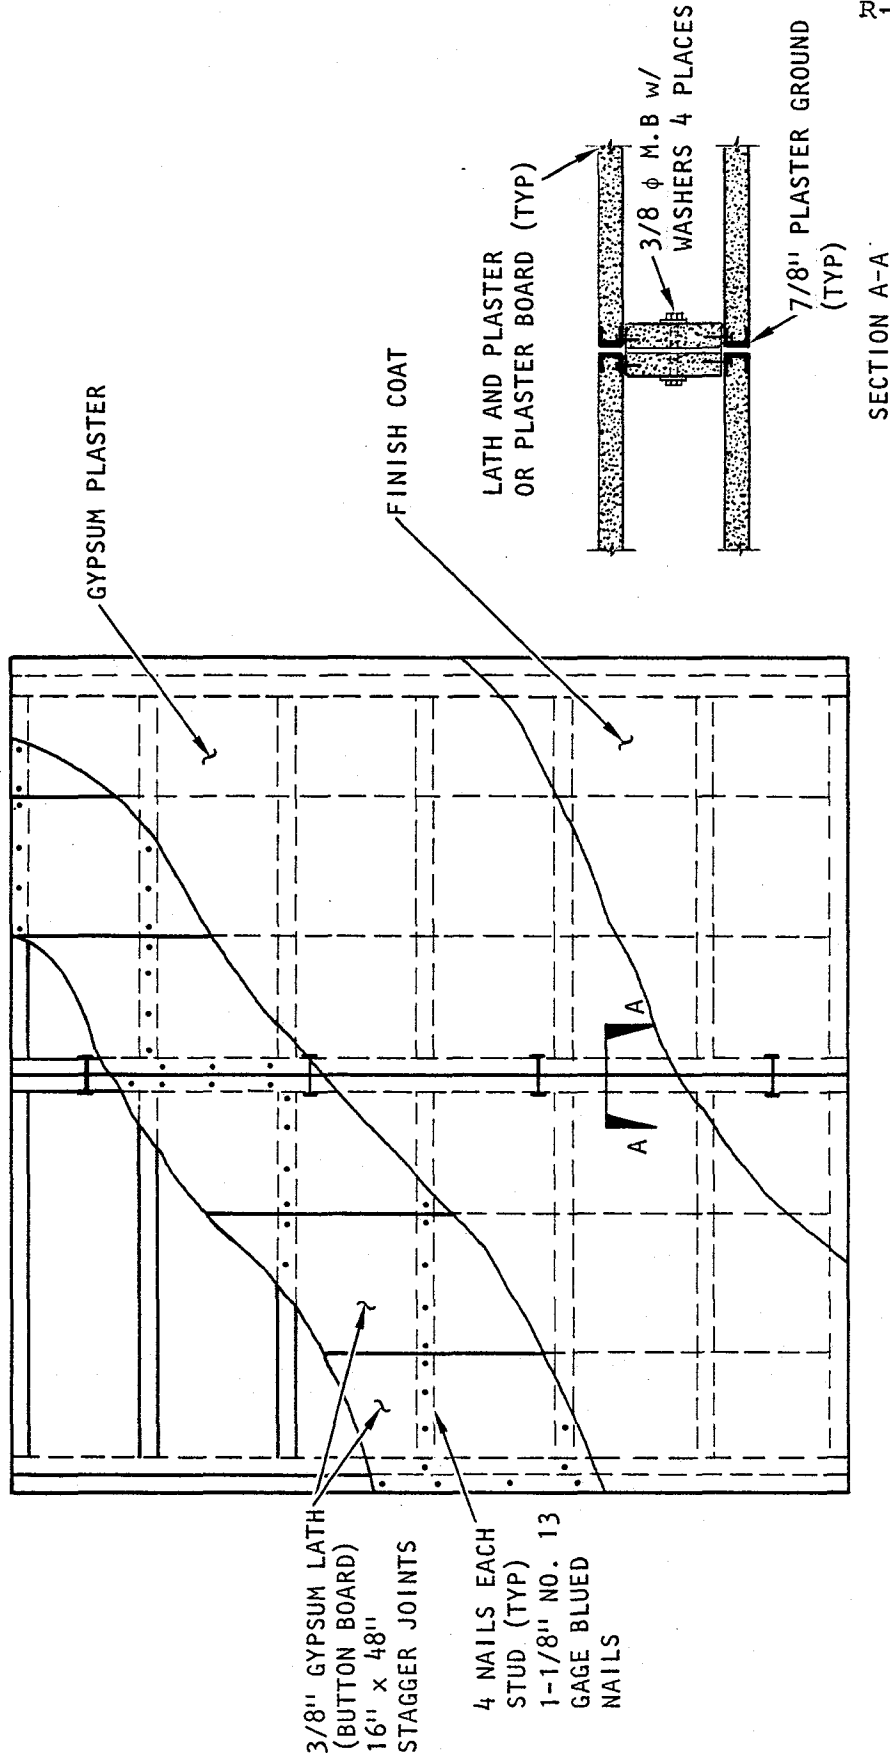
SPECIMEN C - GYPSUM LATH AND PLASTER
